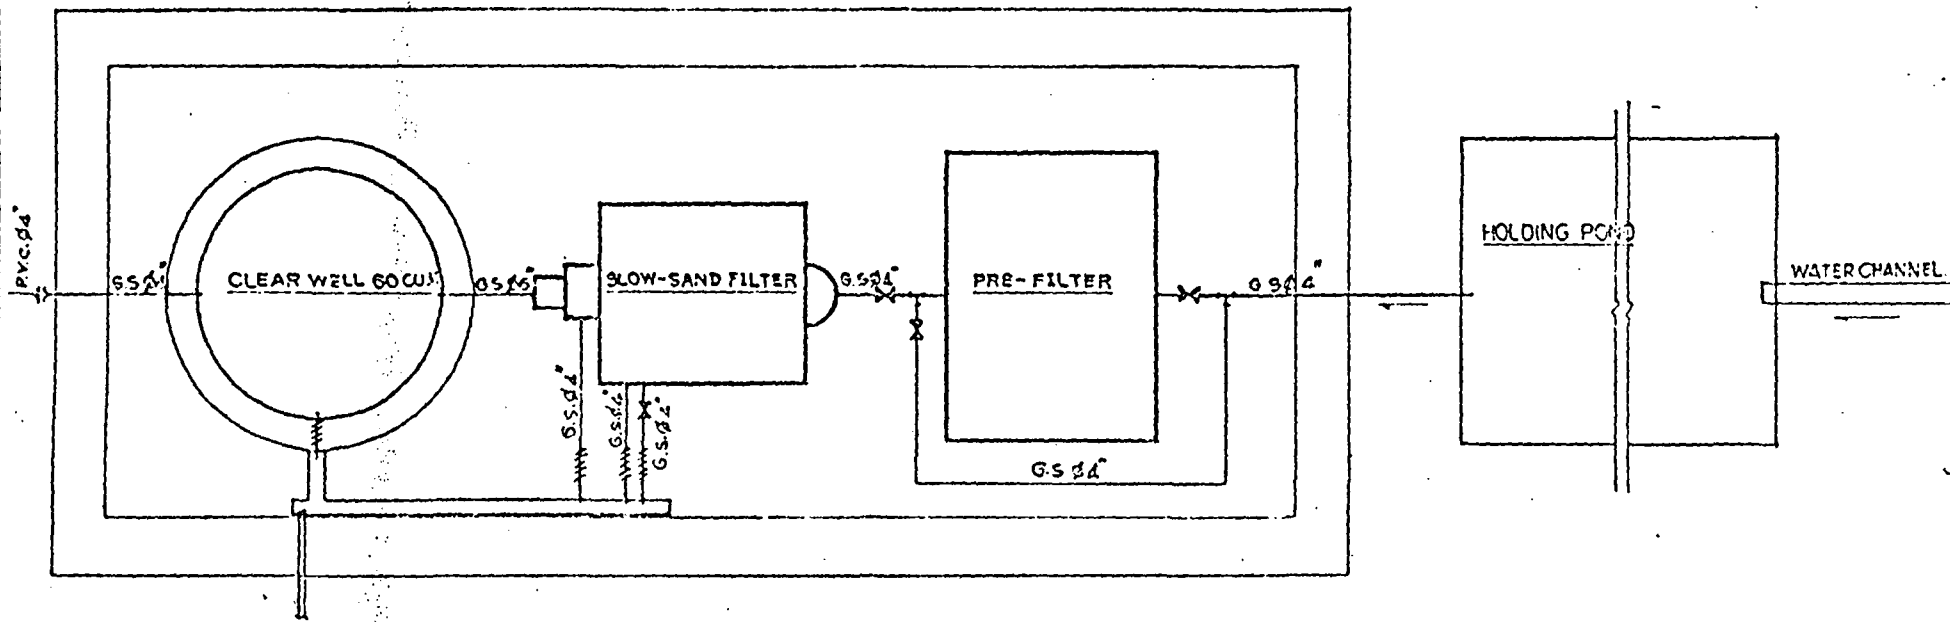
TREATMENT PLANT LAY-OUT PLAN
